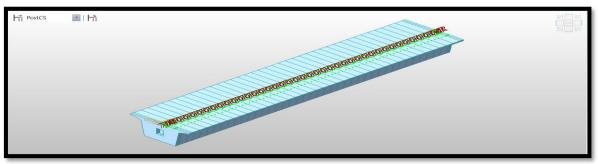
Isometric View Of Two Lane Of Class A Loading on the Bridge
